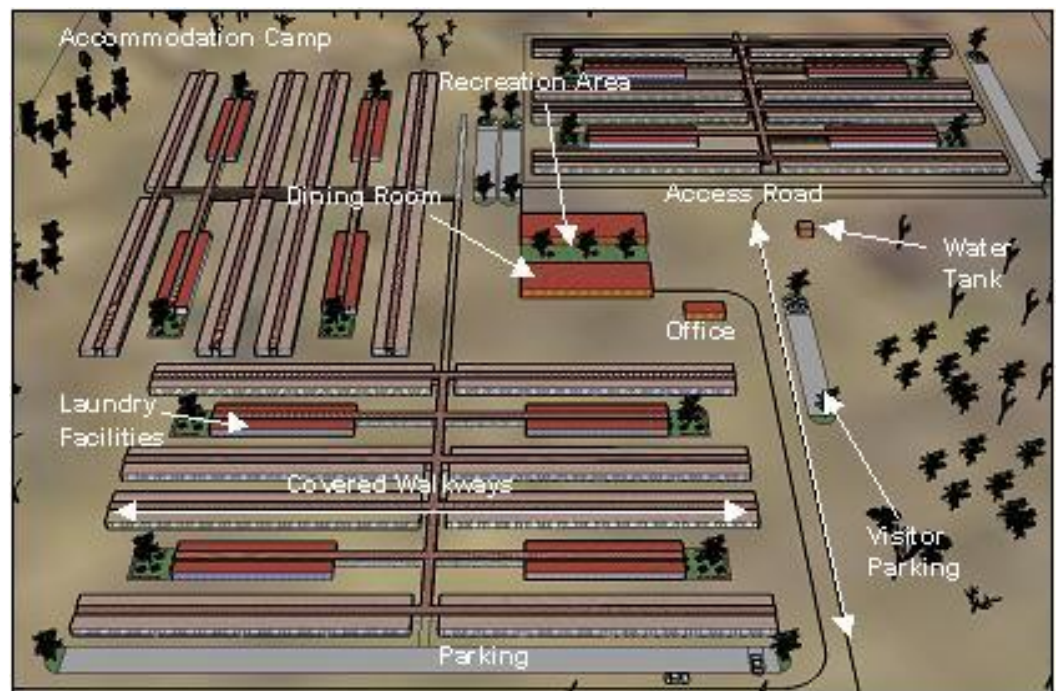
shows the proposed layout of the construction camp. The construction camp is on the western side of the AN Plant site and will include:
